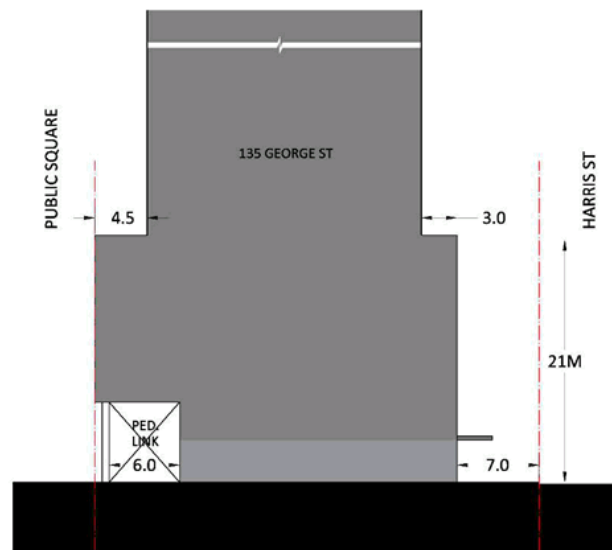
Section showing double height colonnade and setbacks to tower at the corner of Harris and George Streets
